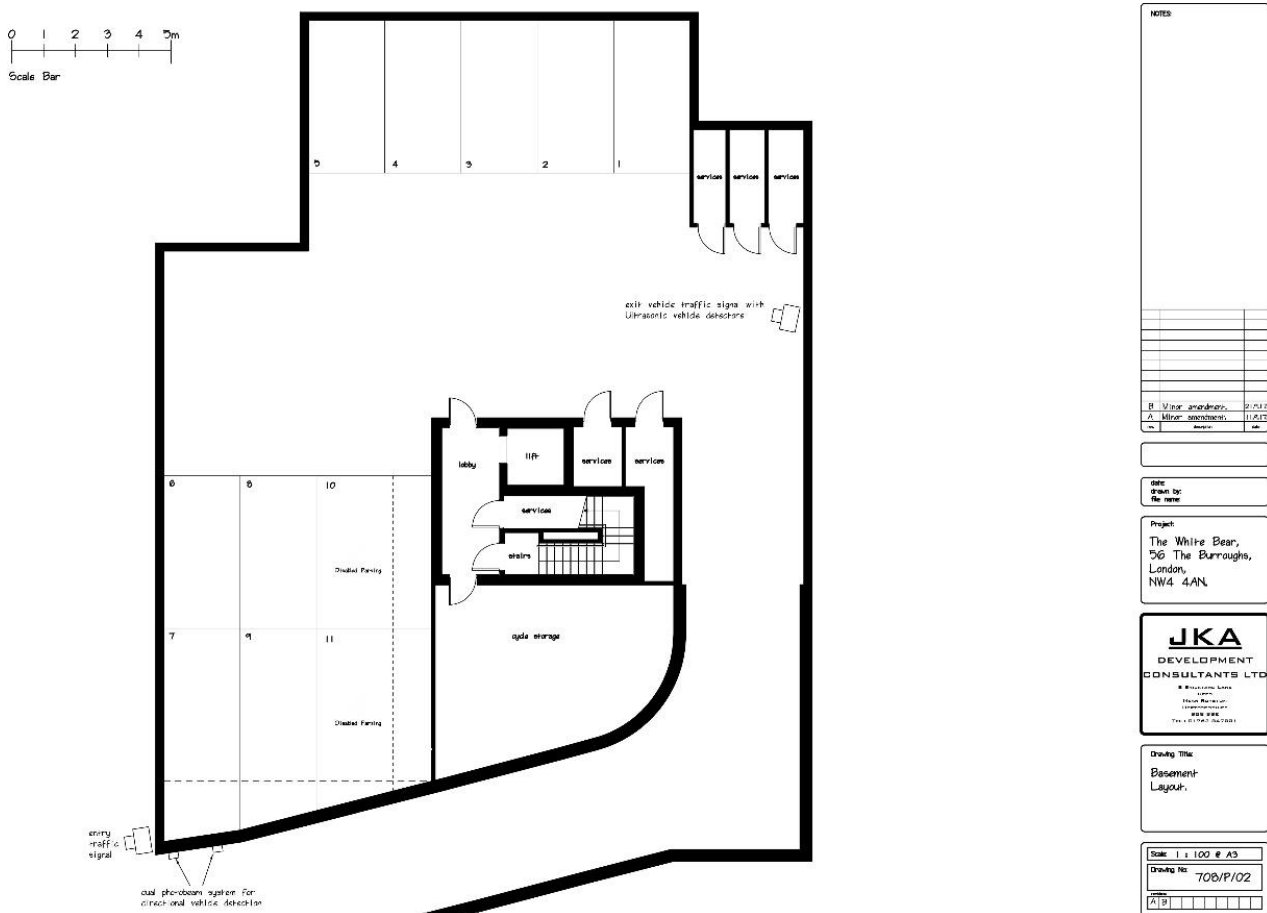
Basement layout plan (JKA Development, Dwg No. 708/P/02 Rev B, 21/09/2017)
